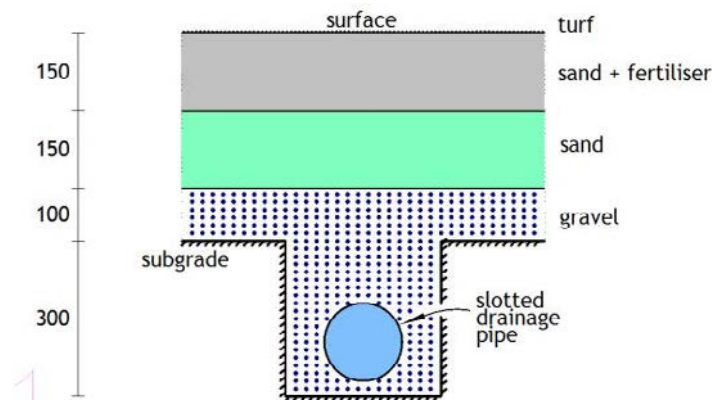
Typical cross-section of the rebuilt outfield (dimensions in millimetres).
